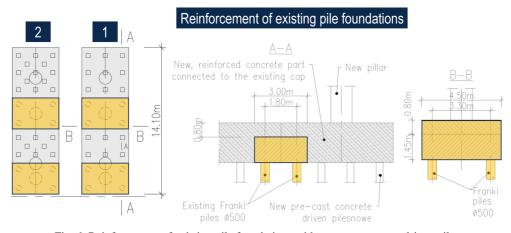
Reinforcement of existing pile foundations with pre-cast concrete driven piles
